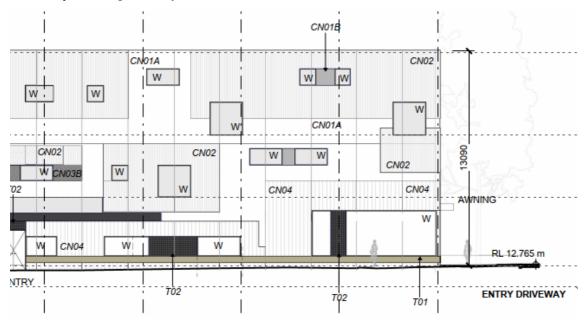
North elevation (Hudsons Road), Source: North East Plot Proposed Elevations + Materials TP110 Rev A by *Six Degrees Pty Ltd
